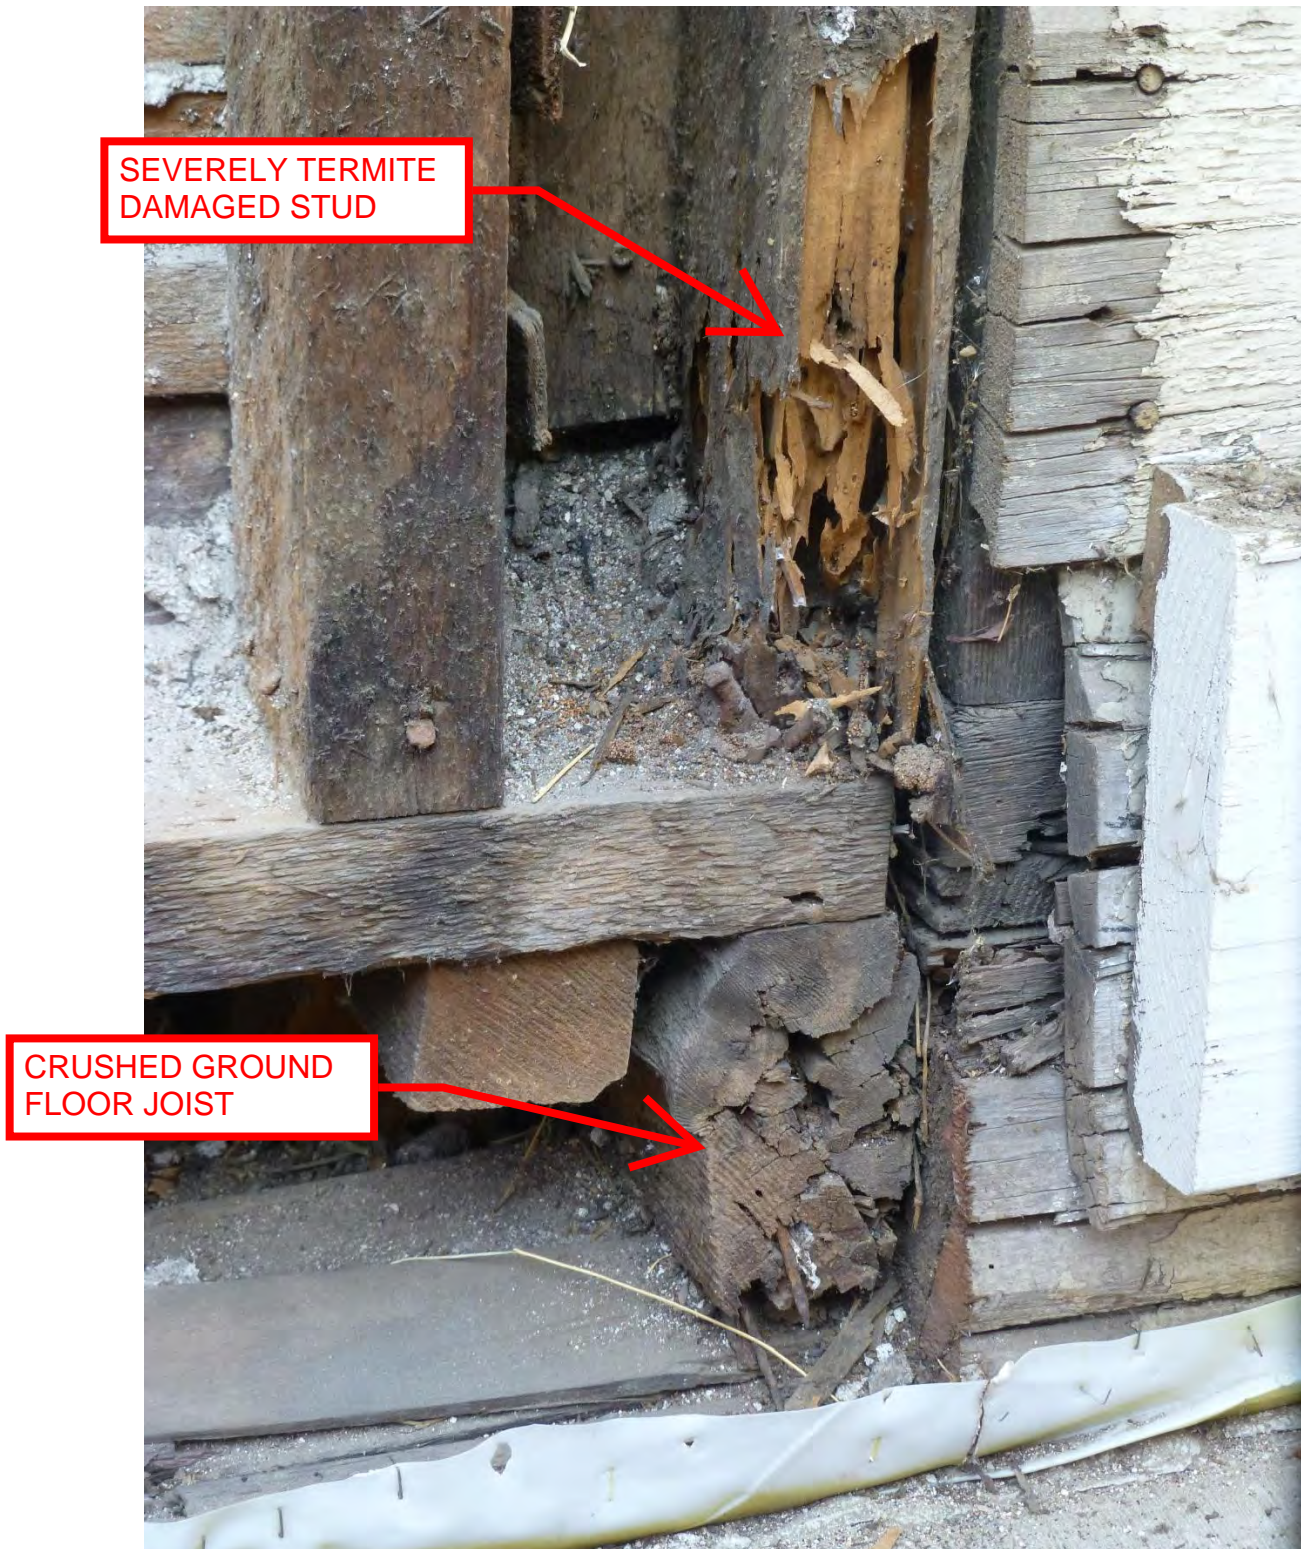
SOUTH ELEVATION – GROUND FLOOR
